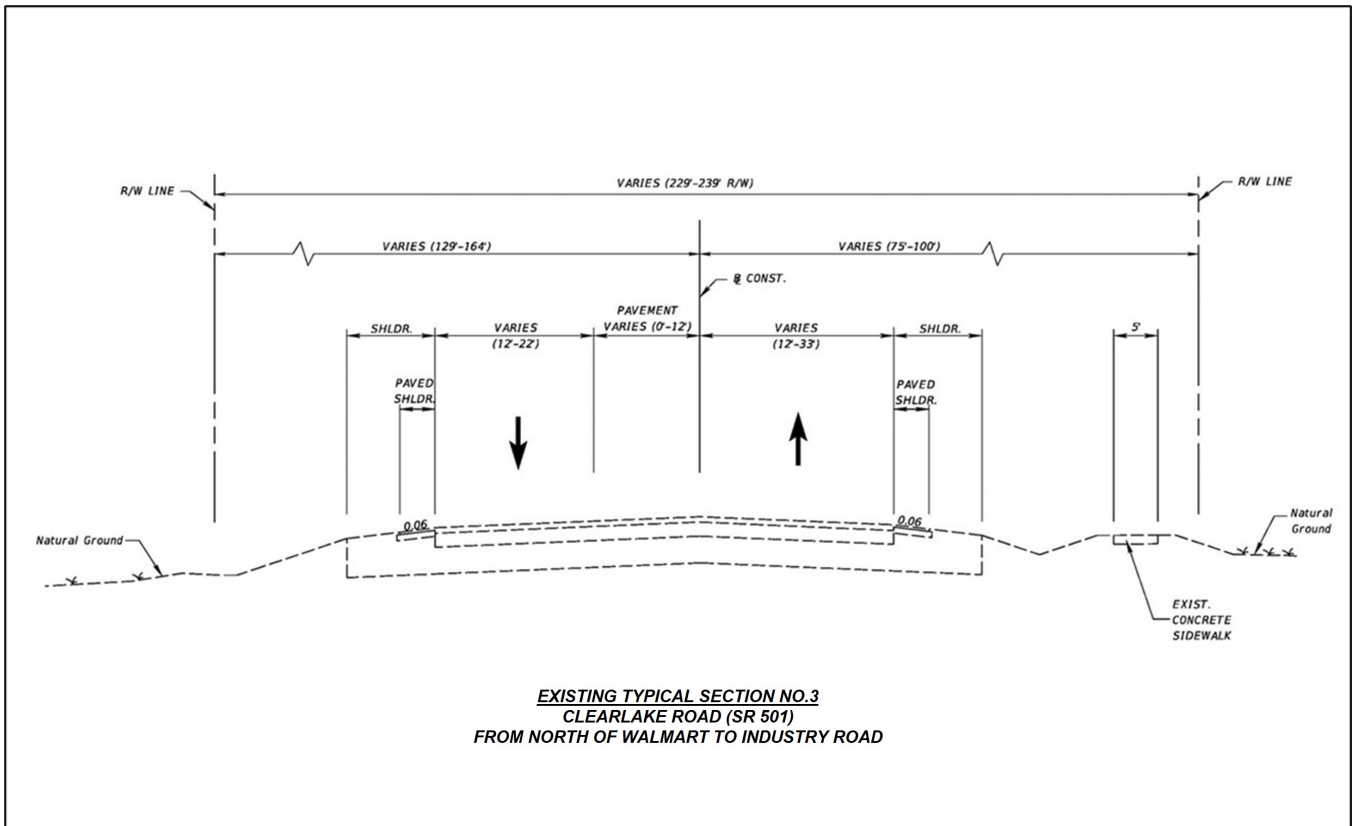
Existing Typical Section - From North of Walmart to Industry Road
